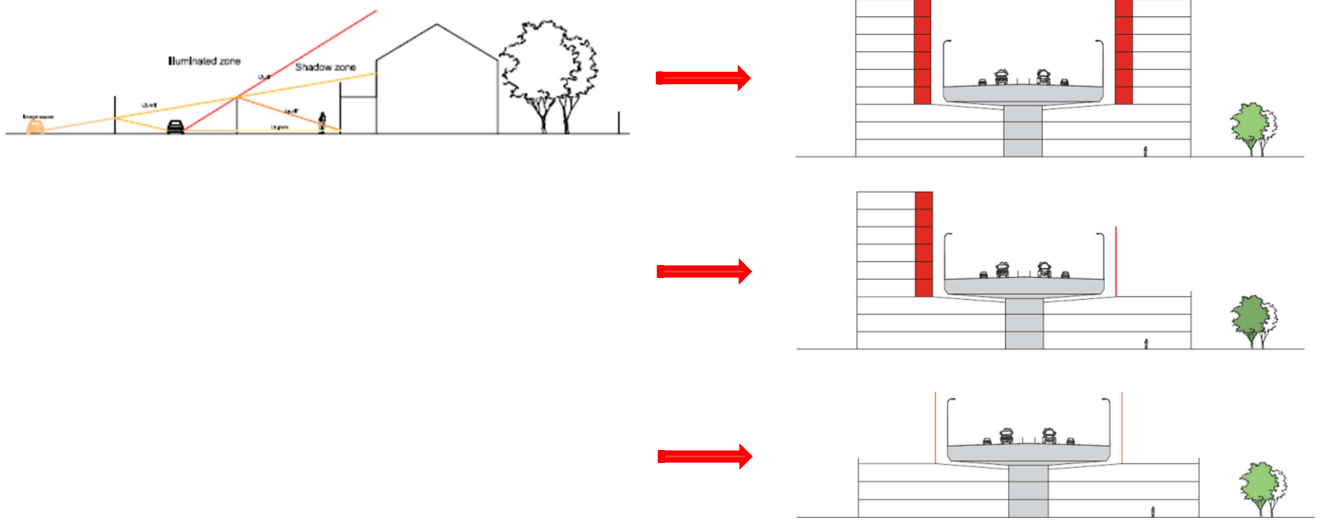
Noise barrier zone principles translated to building design at the A5(Author,2013)
